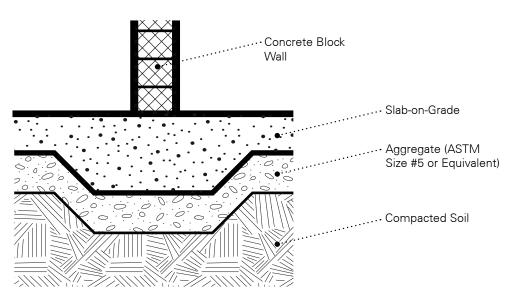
Use of Thickened Slab Footings with the Aggregate Layer Extending Below Them to Minimize Sub-Slab Barriers to Airflow (Elevation View) *Adapted from EPA (1994).
